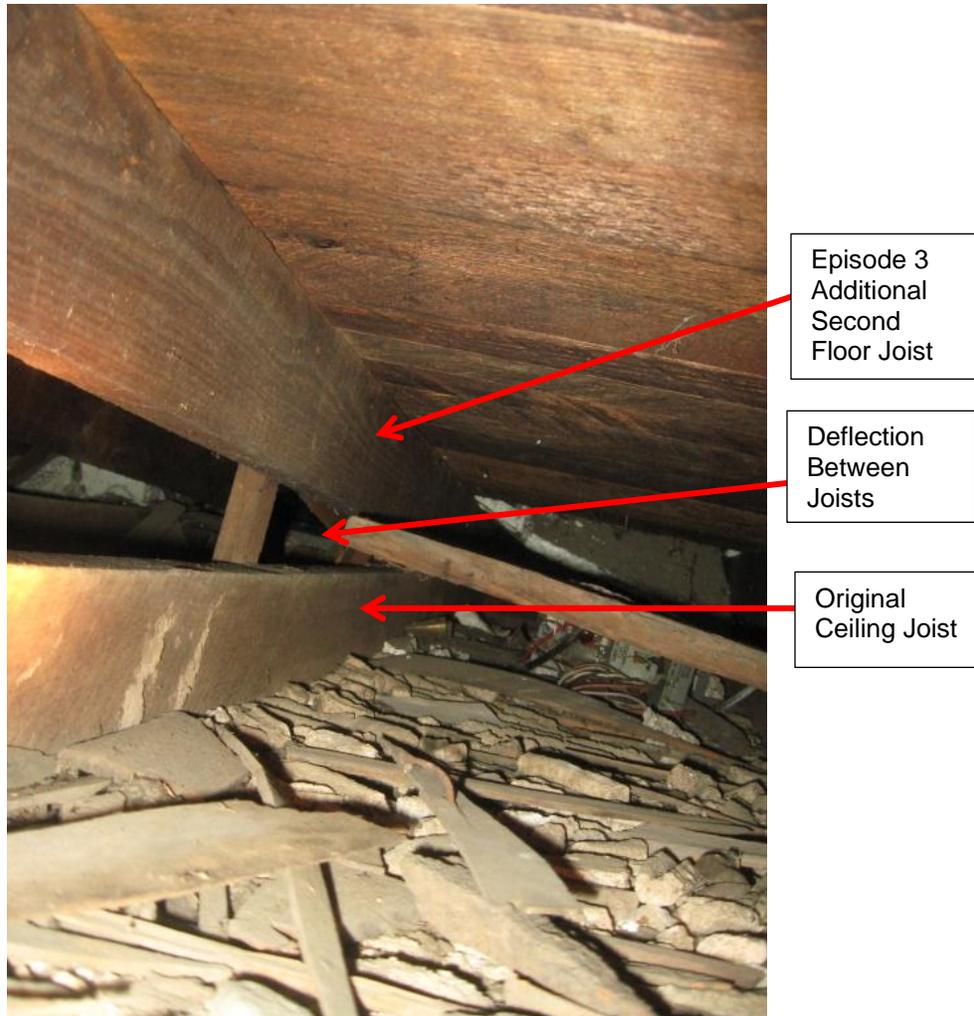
Interior first floor ceiling cavity, looking east. (SEA 2011)
